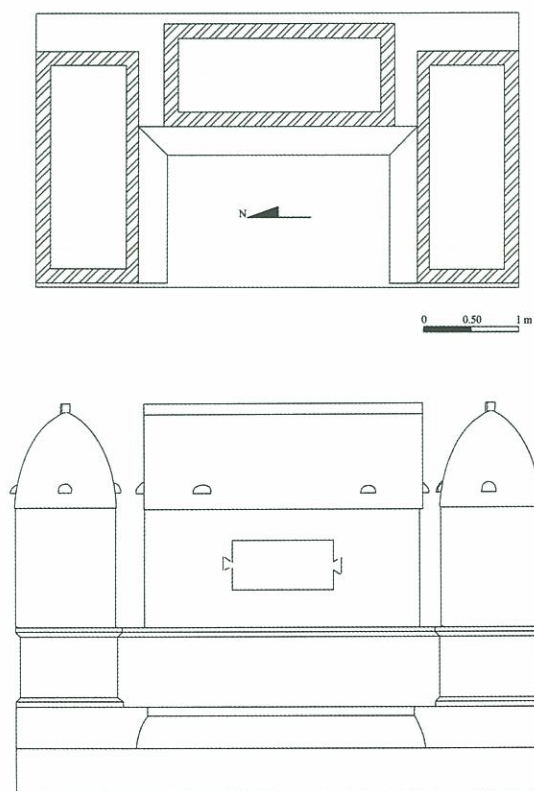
Apollonia, tomb with exedra 1, plan, facade elevation.
